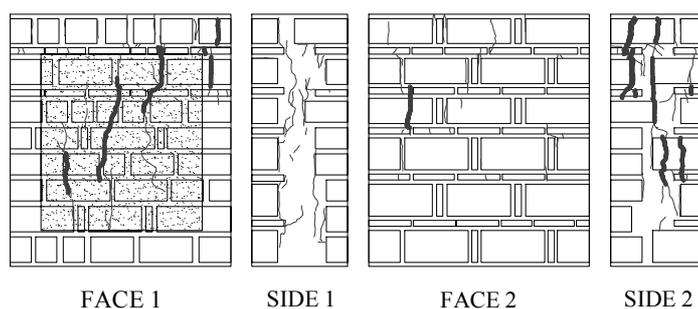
Typical failure mode of wallettes in compression; Wallette 3
